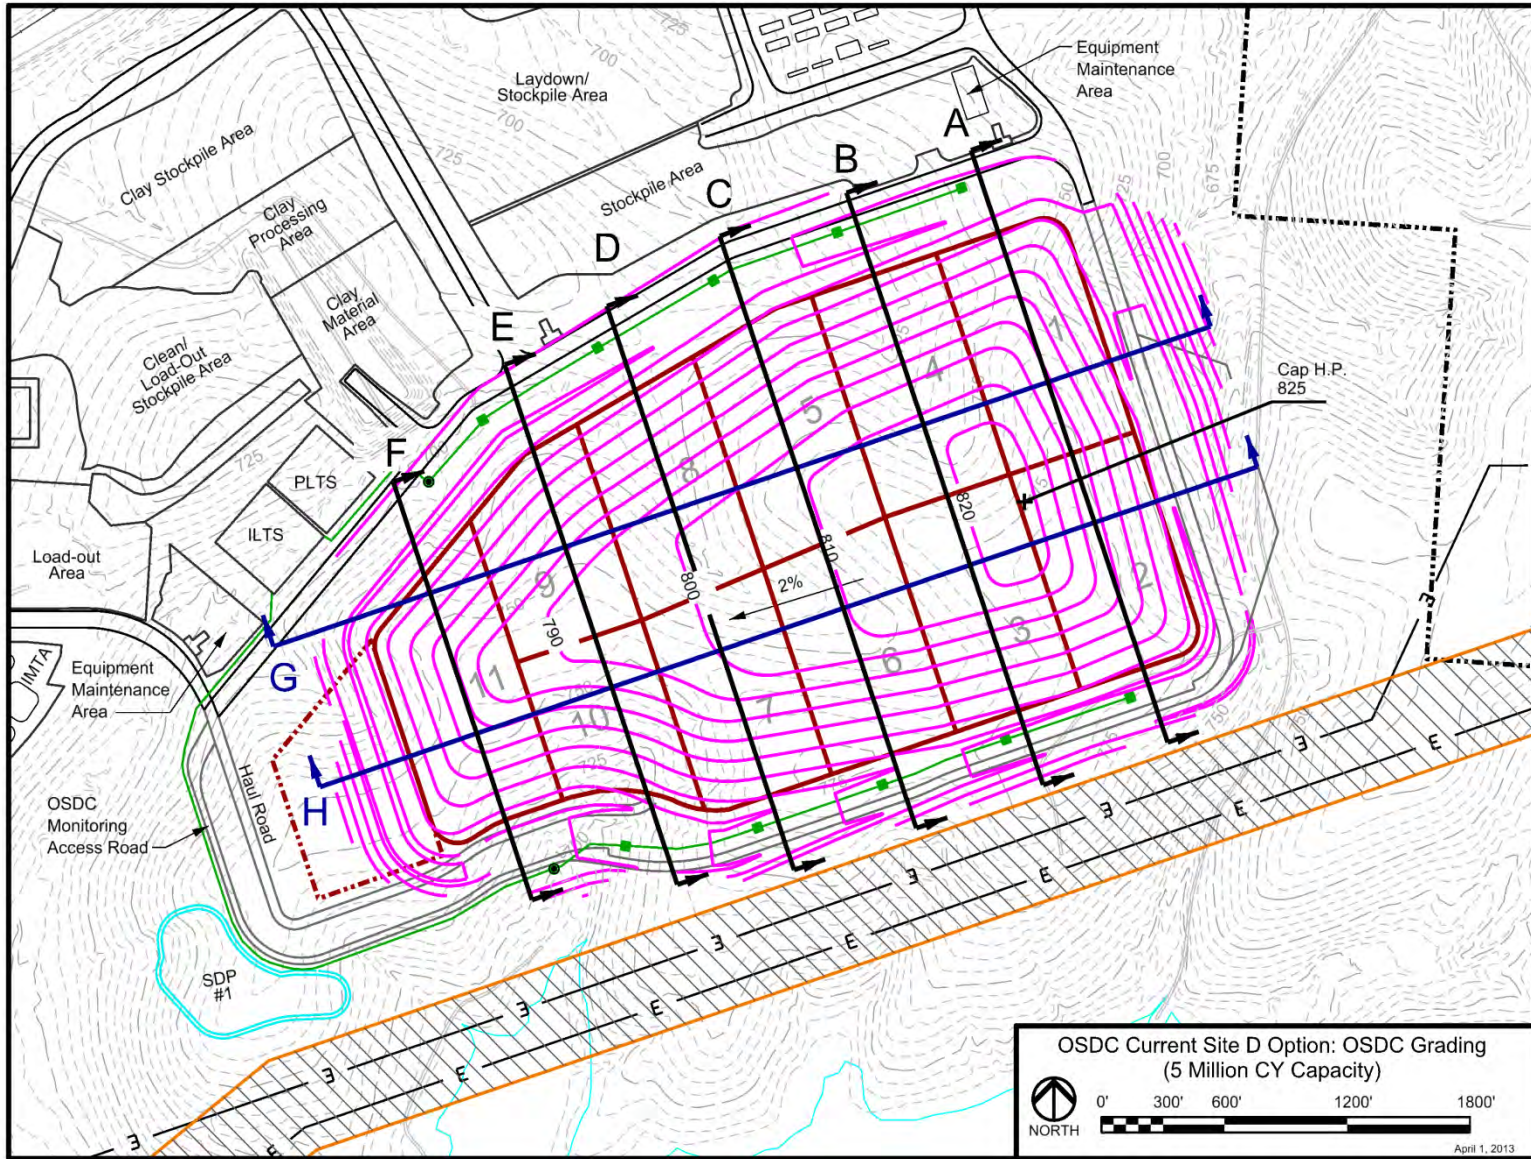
OSDC 5 million cy Site D Cross-section Plan
